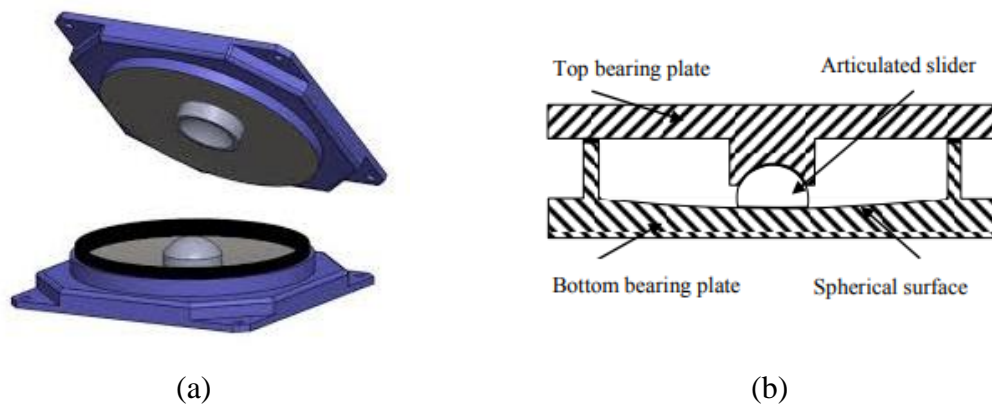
Single pendulum bearing (a) 3D view and (b) section view (Gillich et al, 2018)
